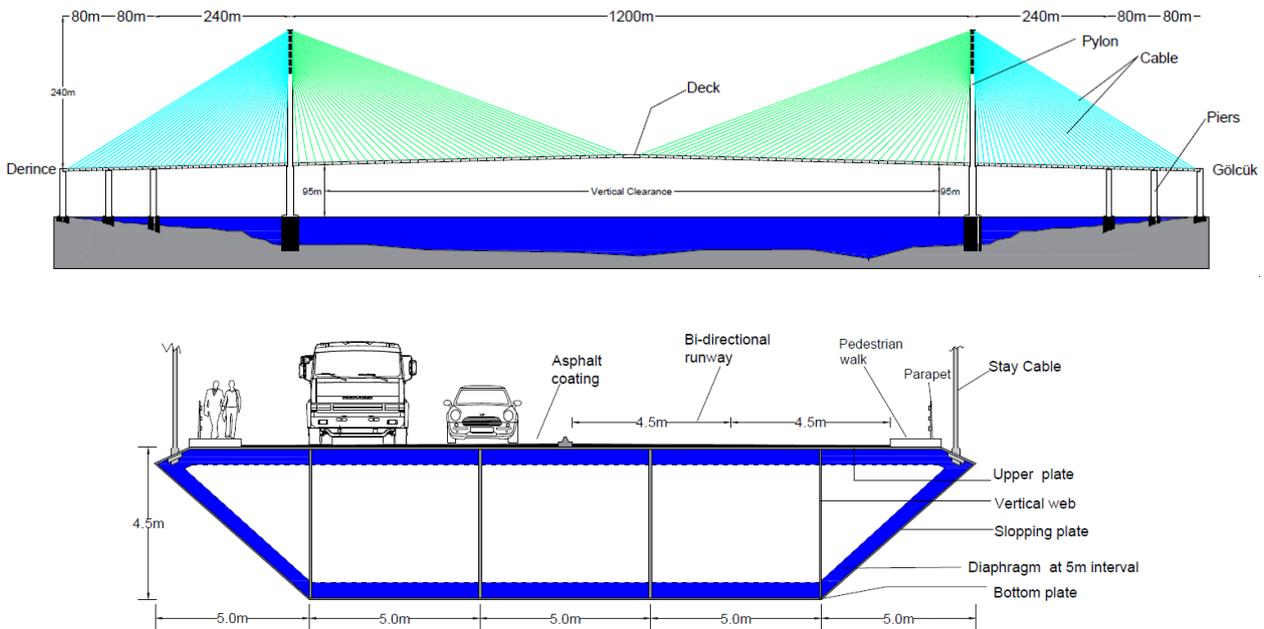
Side view of the bridge and the cross-section details of the bridge deck.
